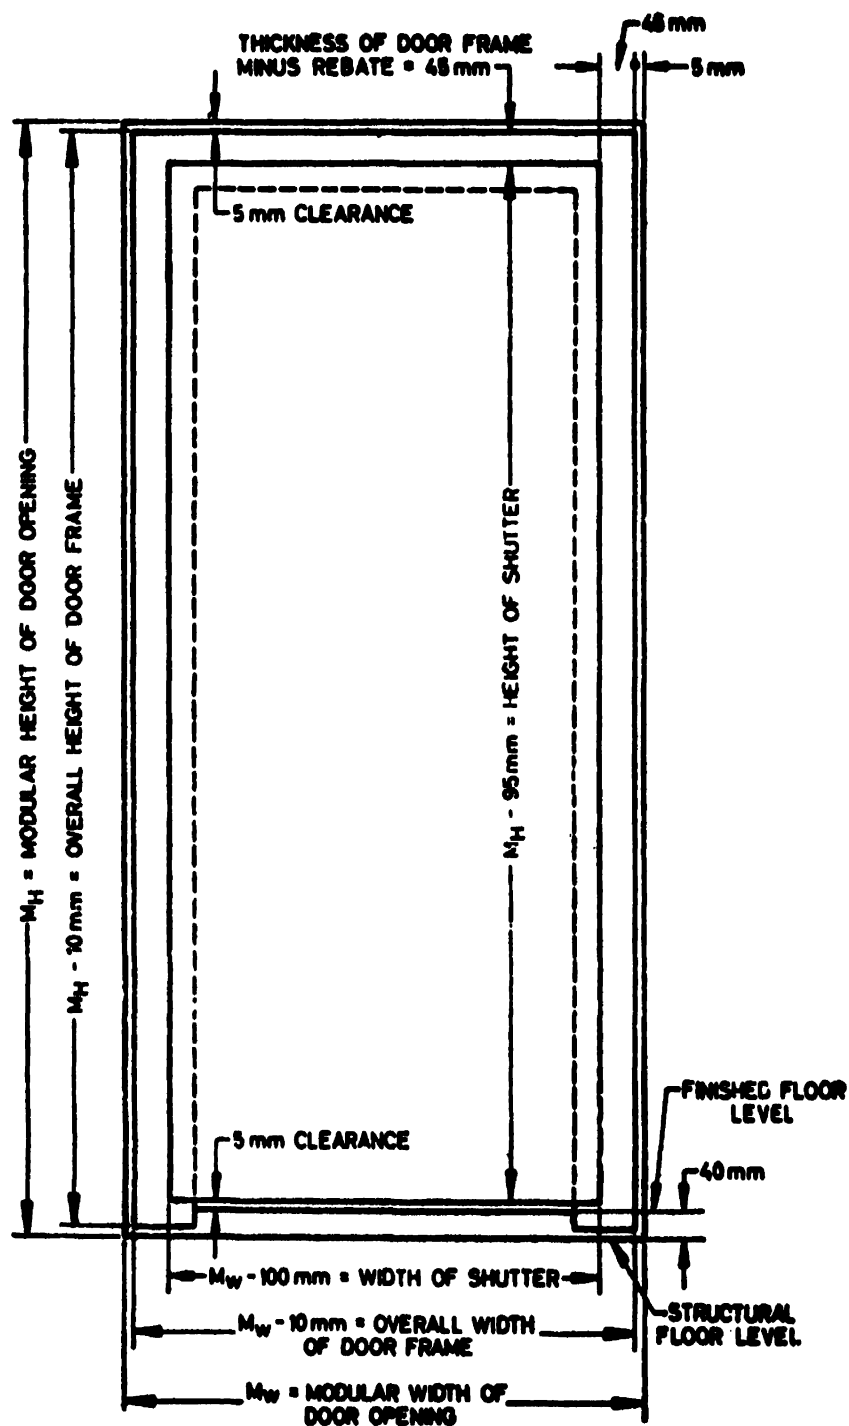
SKETCH ILLUSTRATING DIMENSIONS OF SHUTTER
